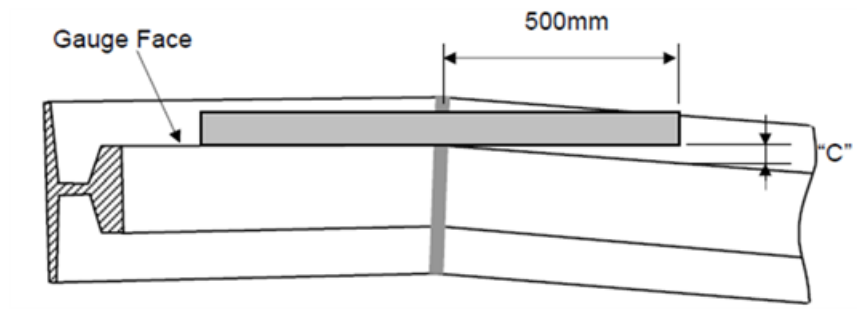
Weld misalignment tolerance in horizontal plane (tightening)
